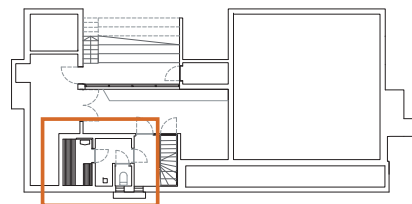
Semi-subterranean garden staircase and workshop openings.
